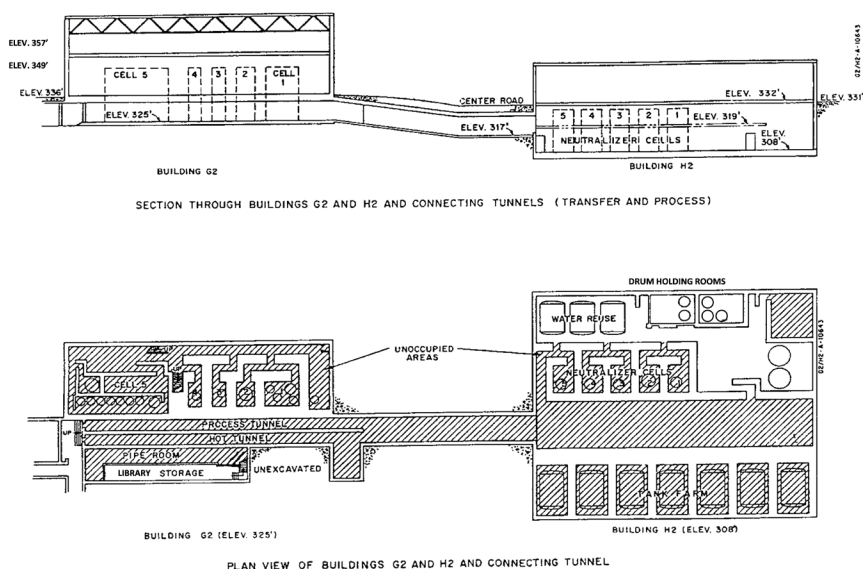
Schematic of SPRU facility showing cross-sections (top drawing) and plan views (bottom drawing) of Buildings G2 and H2.
